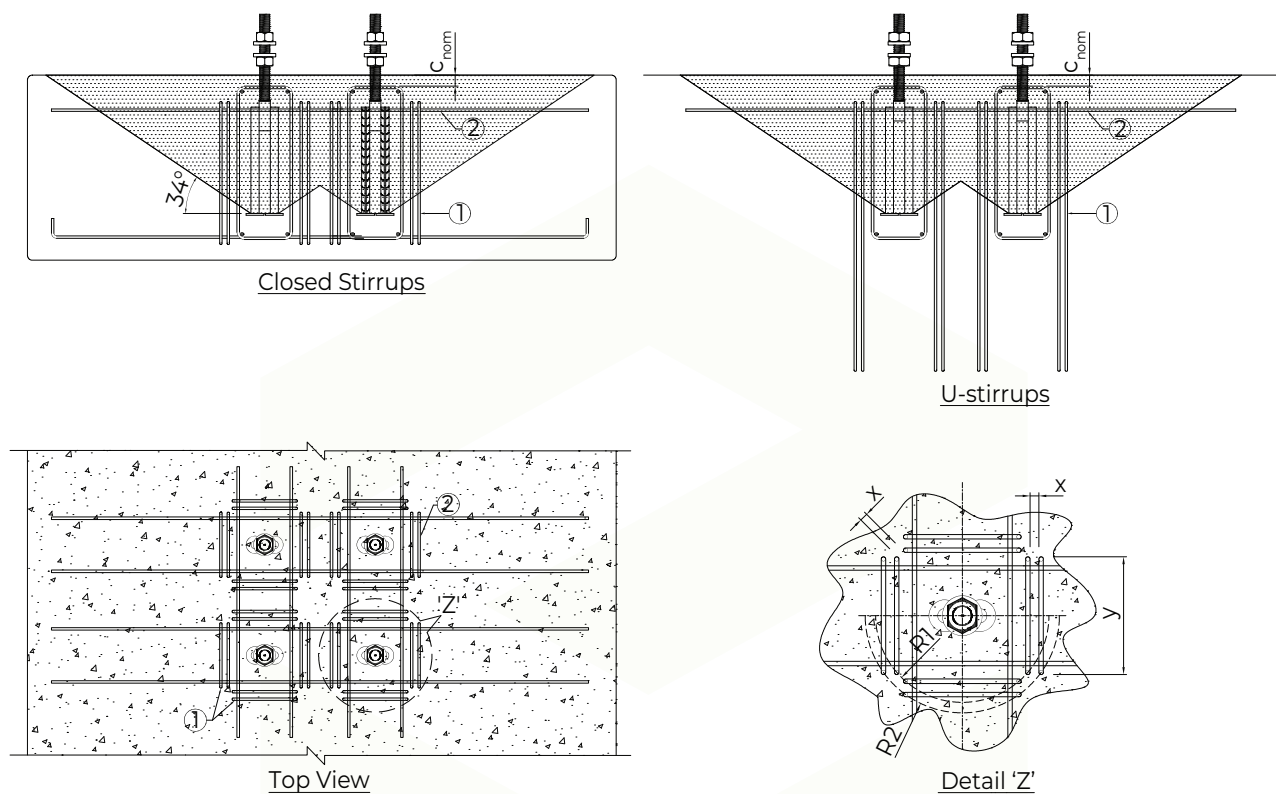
(Concrete Cone Reinforcement for ESB-S)
